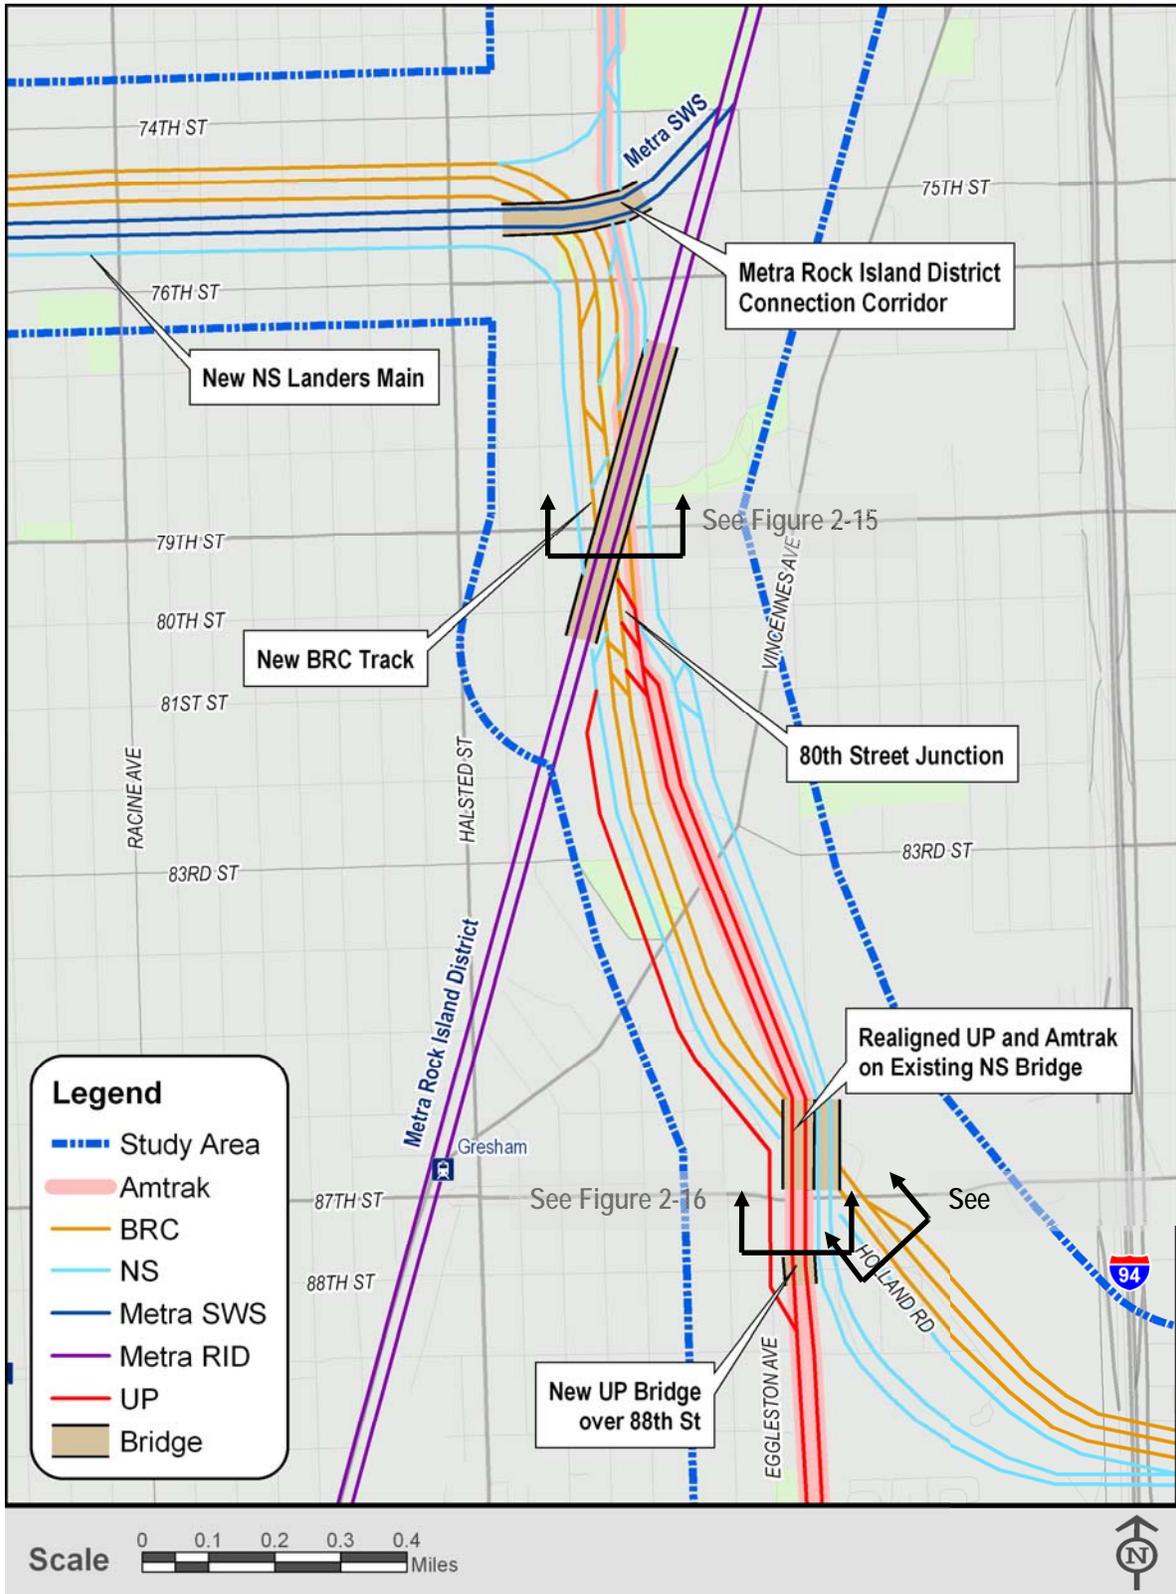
Alternate 80-2 Proposed Track Schematic – 80th Street Junction
